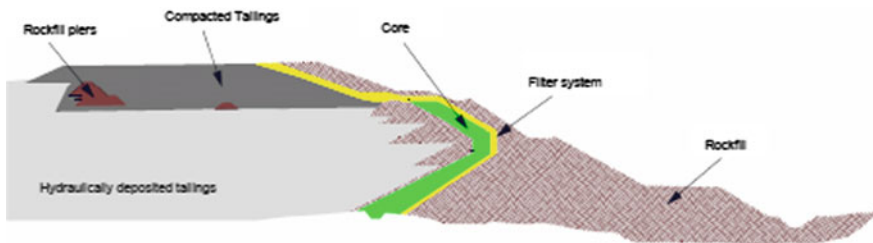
Centreline construction at Zinkgruvan MWF, Sweden (Cross-section courtesy of SWECO)
